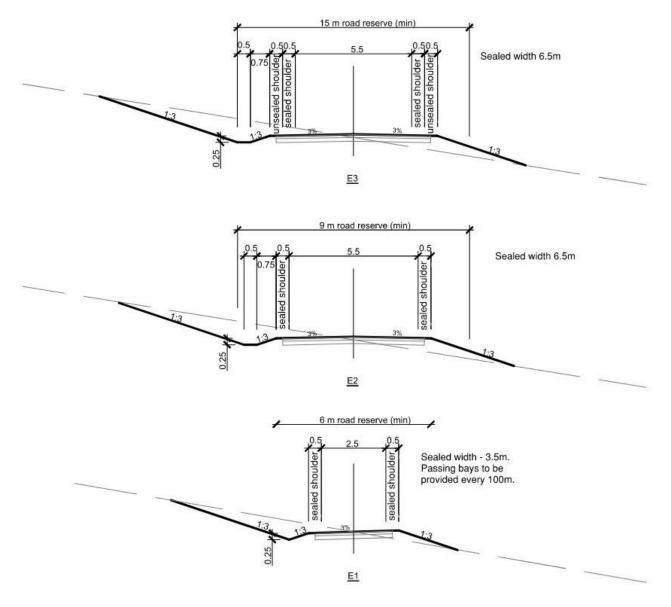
Typical sections for type E1, E2 and E3 roads complying with QLDC LDSC
